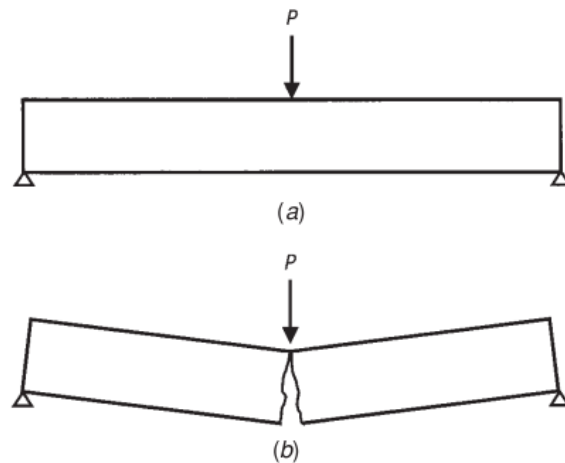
Cracks on a concrete plane (a) Bending Force < Tensile, (b) Bending Force > Tensile [84].
